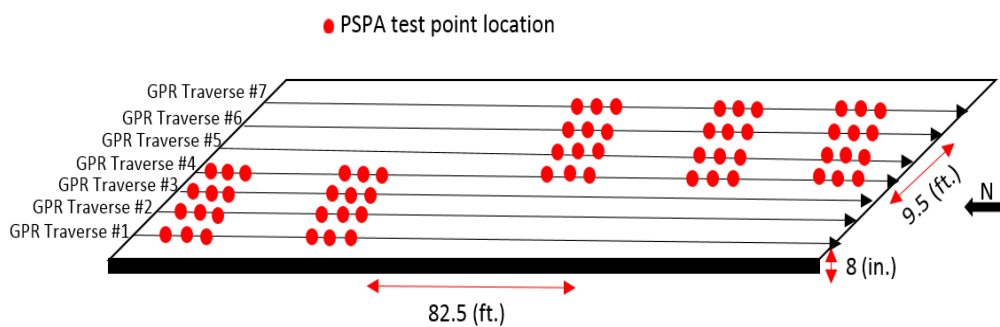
Plan view map depicting GPR traverses and PSPA test locations on the bridge deck (not to scale).
